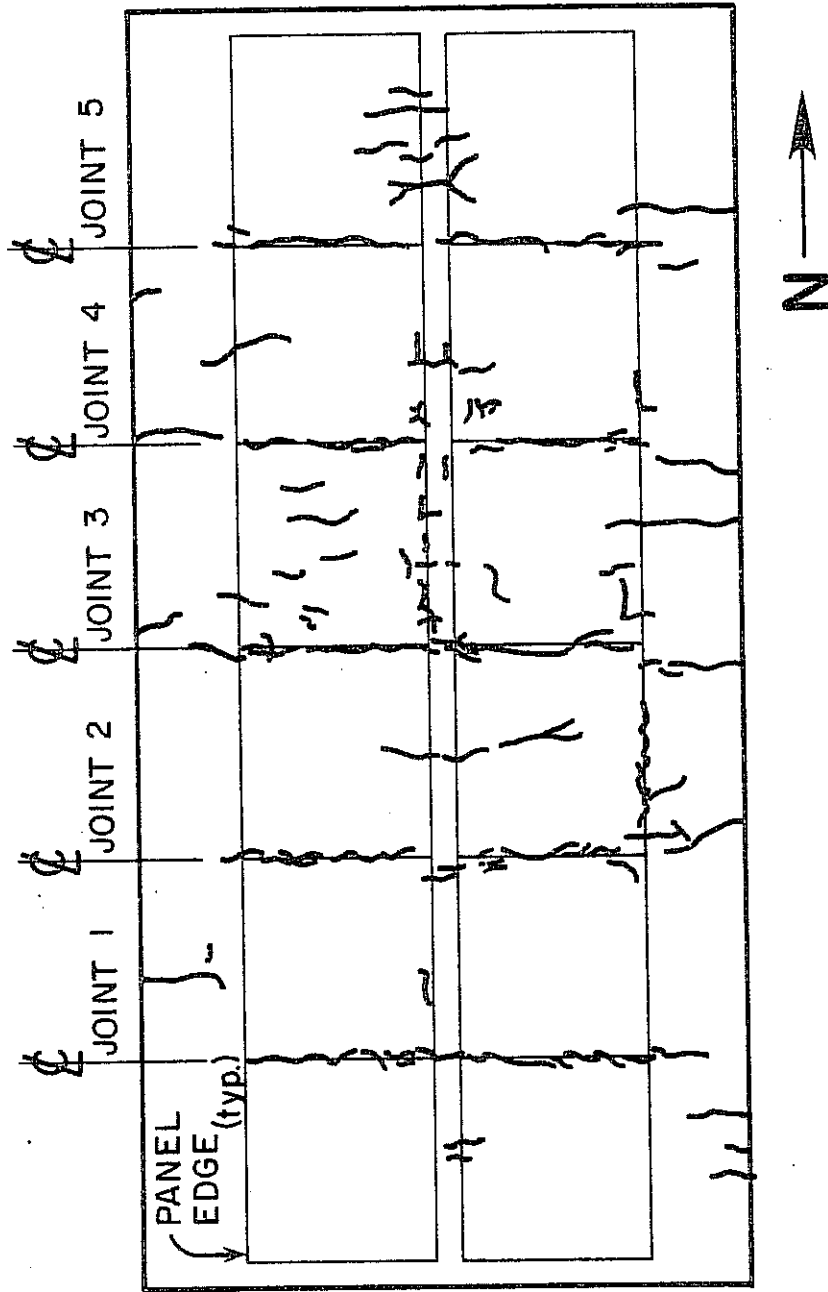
CRACKING PATTERN AFTER FATIGUE TEST
